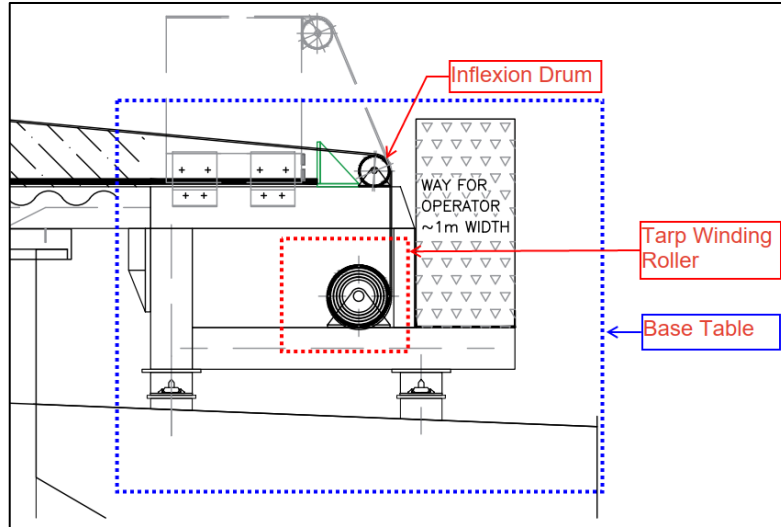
Base Table Sketch with the Winding Roller and Inflection Drum
